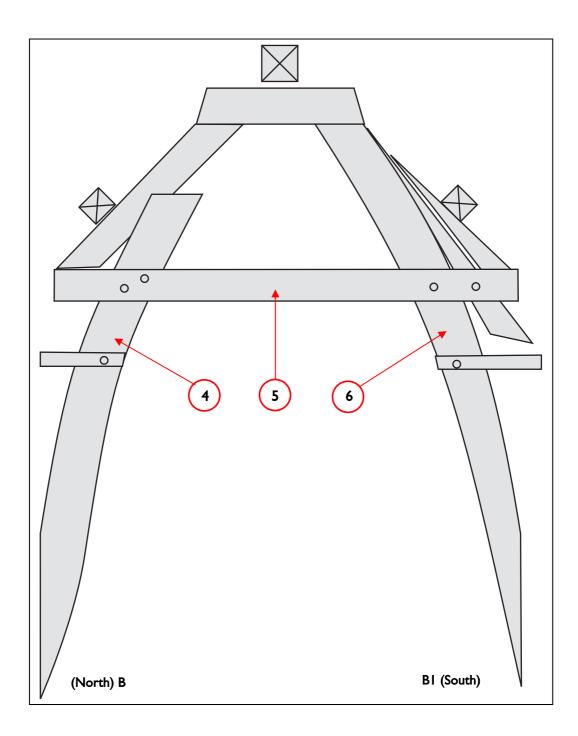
Schematic section of truss B-B1 to show sampled timbers (viewed from the west looking east)
